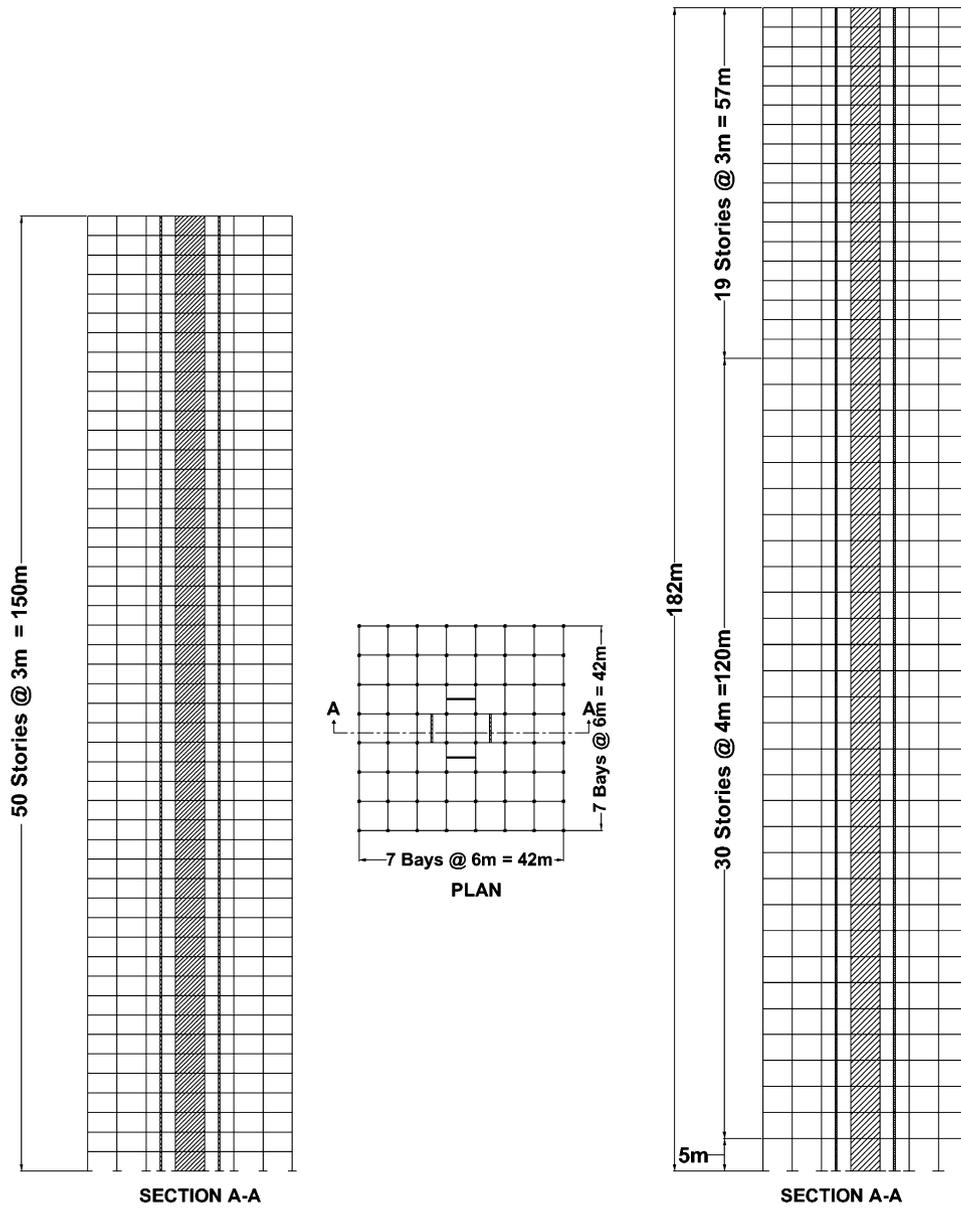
Fifty-storey building plan and elevation for uniform and non-uniform height.
